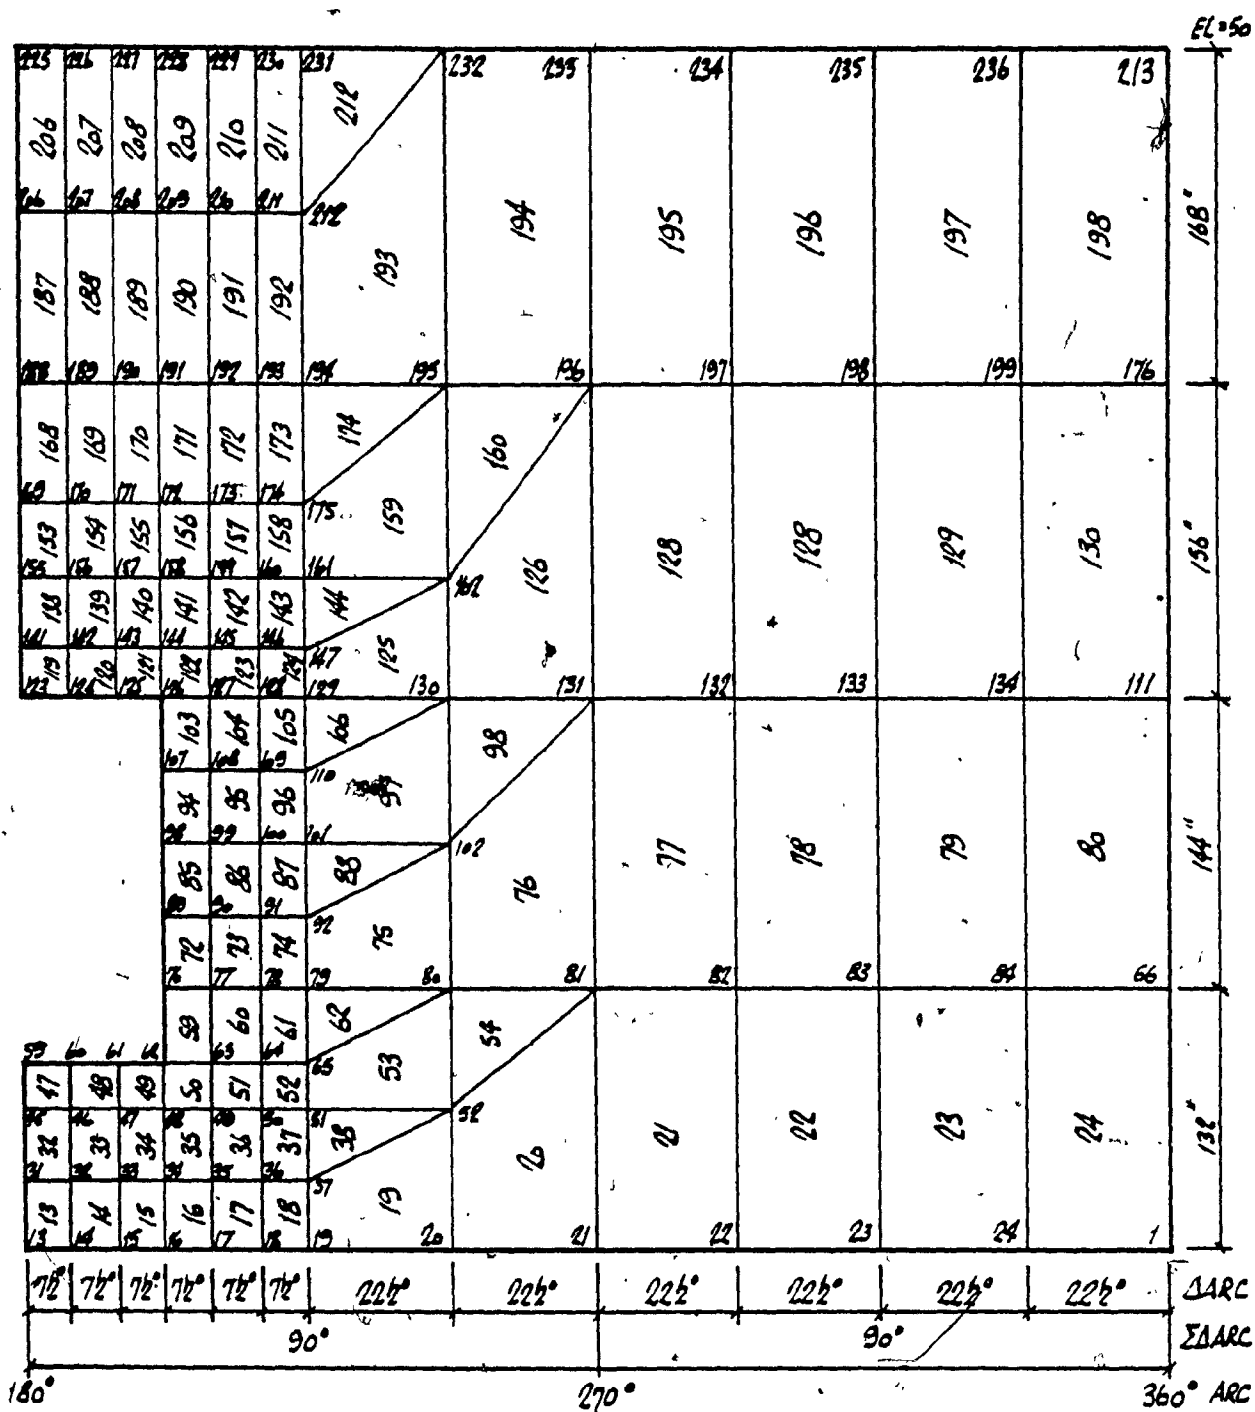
HALF ELEVATION, MODEL II, EL 0' TO 50'
